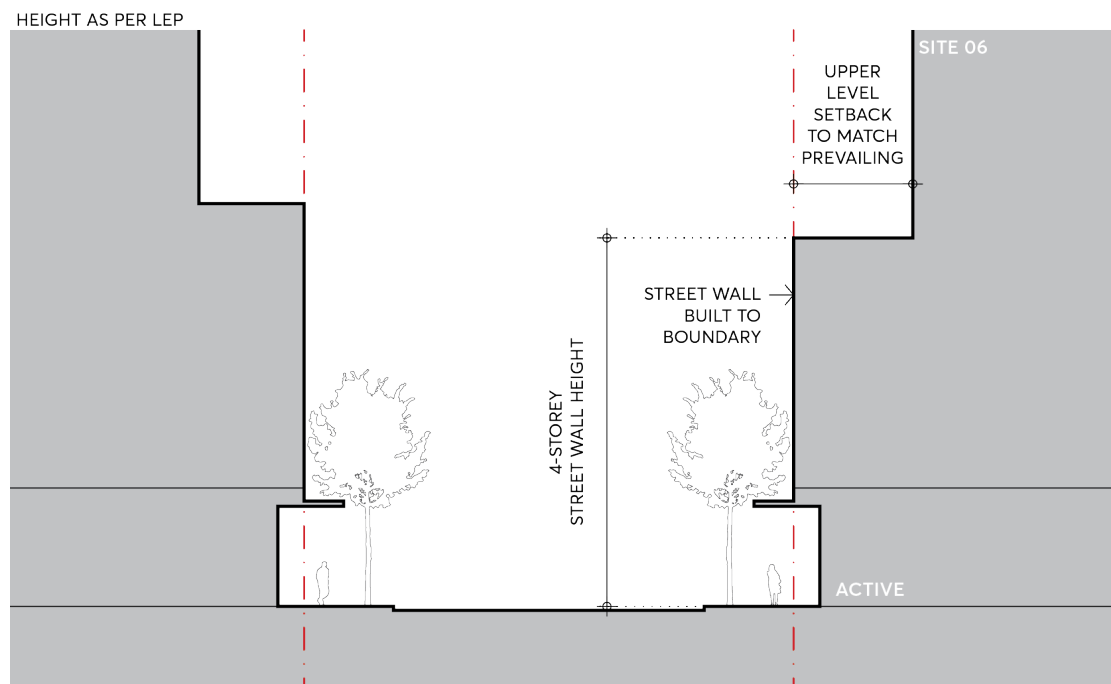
Cowper Street (Section C) Setbacks and Street Wall Height
